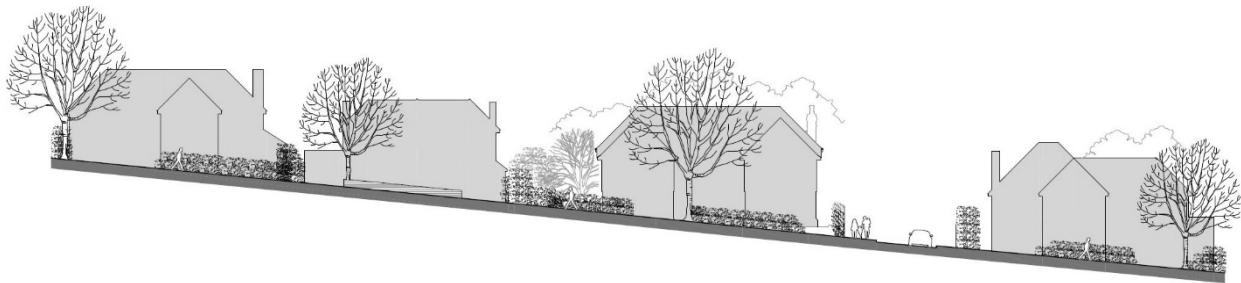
Proposed street scene from 69 Copse Wood Way
